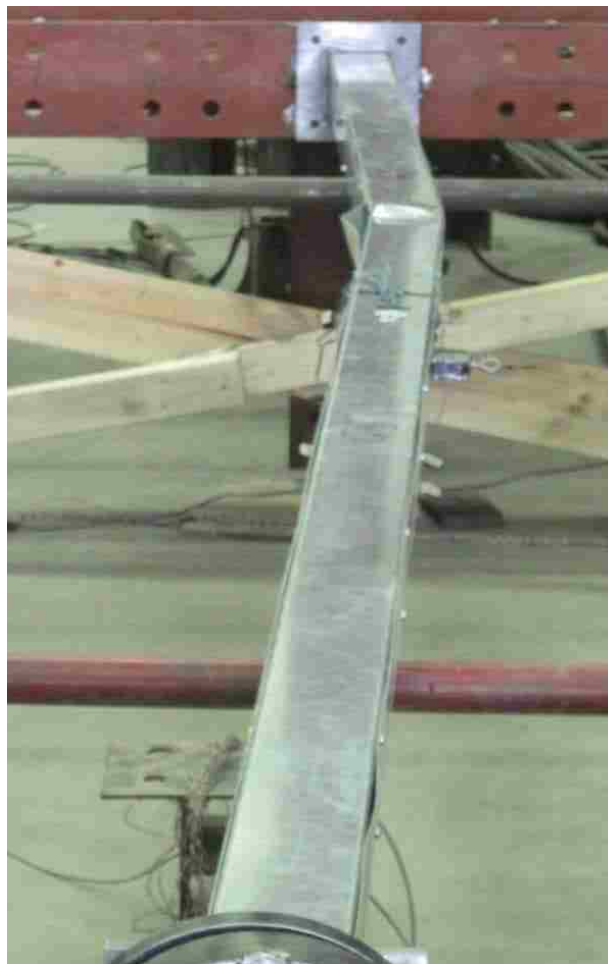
Photo of Buckled “Adhesive and Screws” Column During Test to Failure
